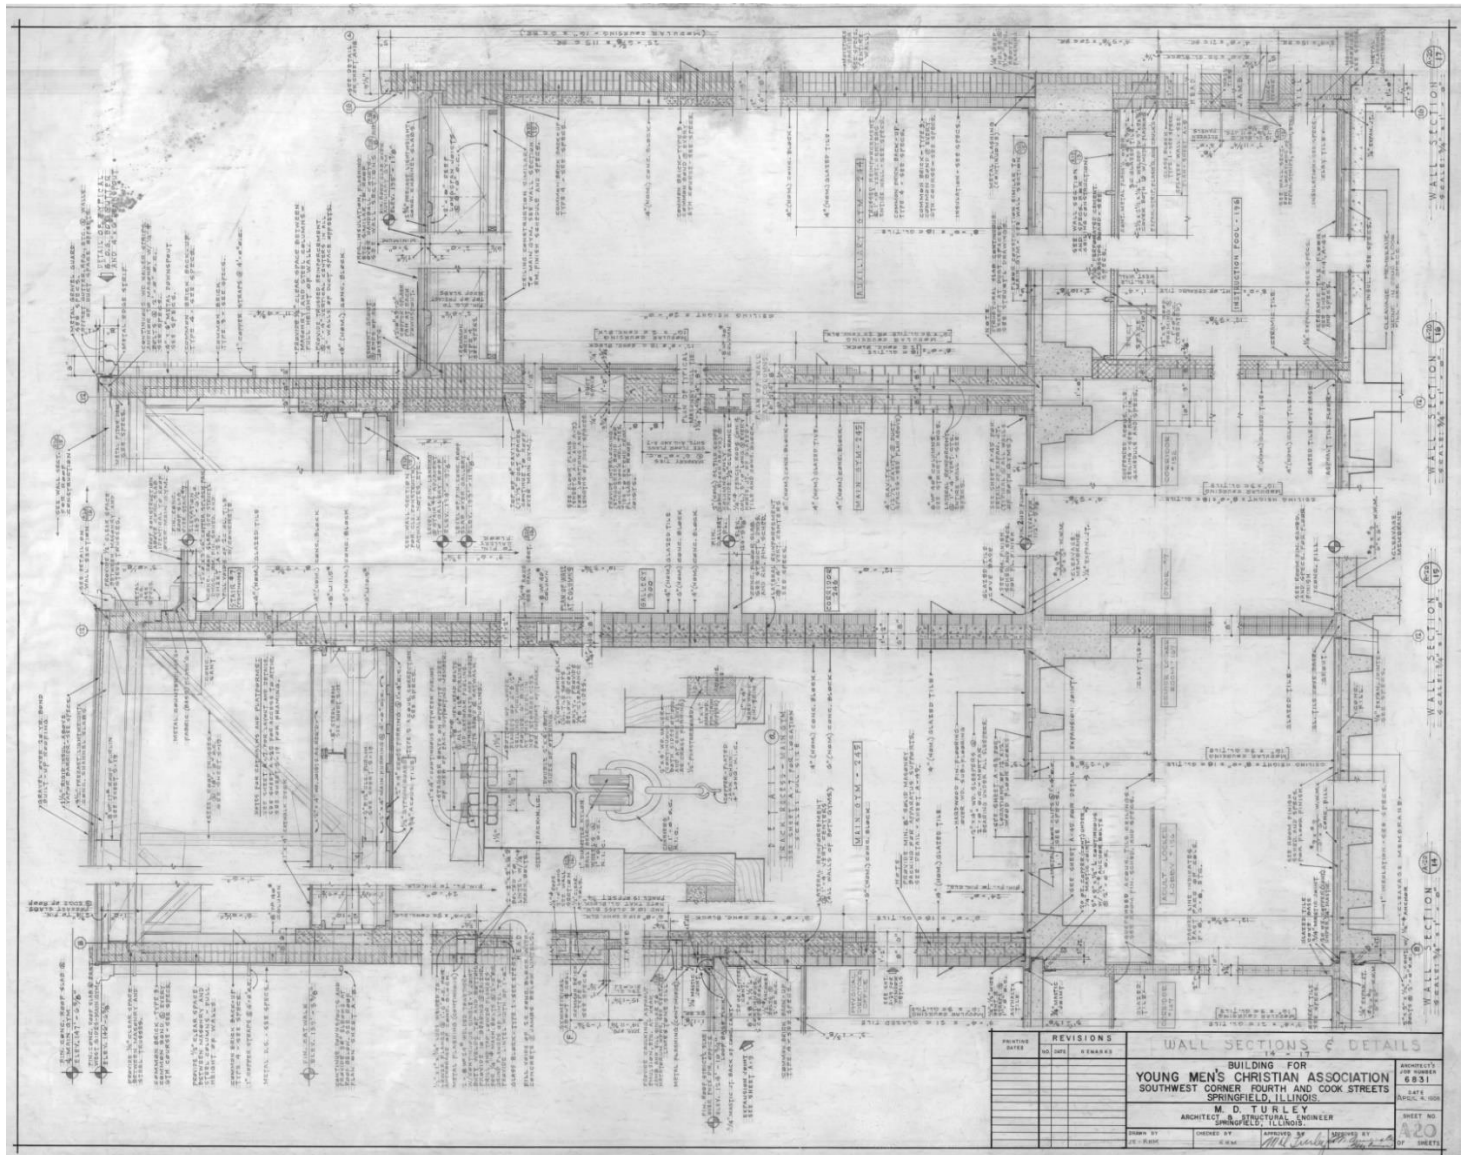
Wall Sections and Details (Turley 1958; Sheet No. A-20).
